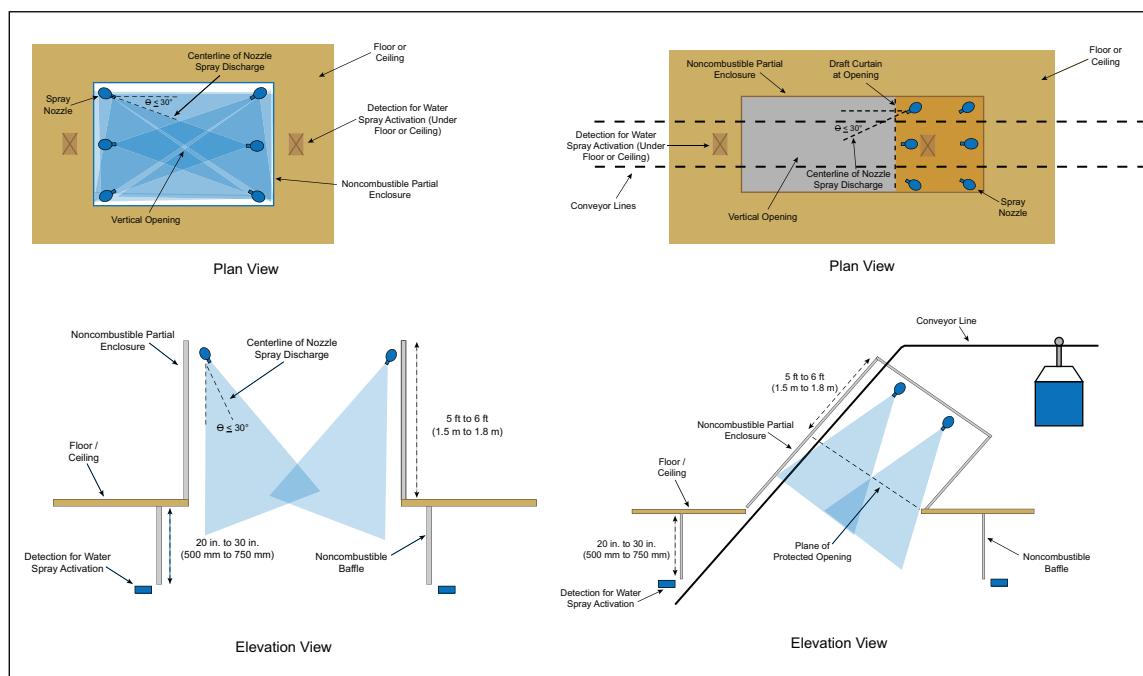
Protection of conveyor opening in a floor/ceiling: vertical opening on left; inclined opening on right
